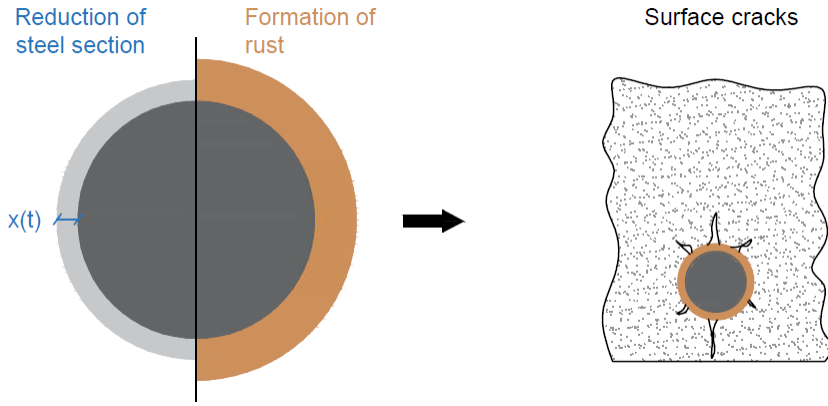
Reduction of steel section and cover cracking due to corrosion
